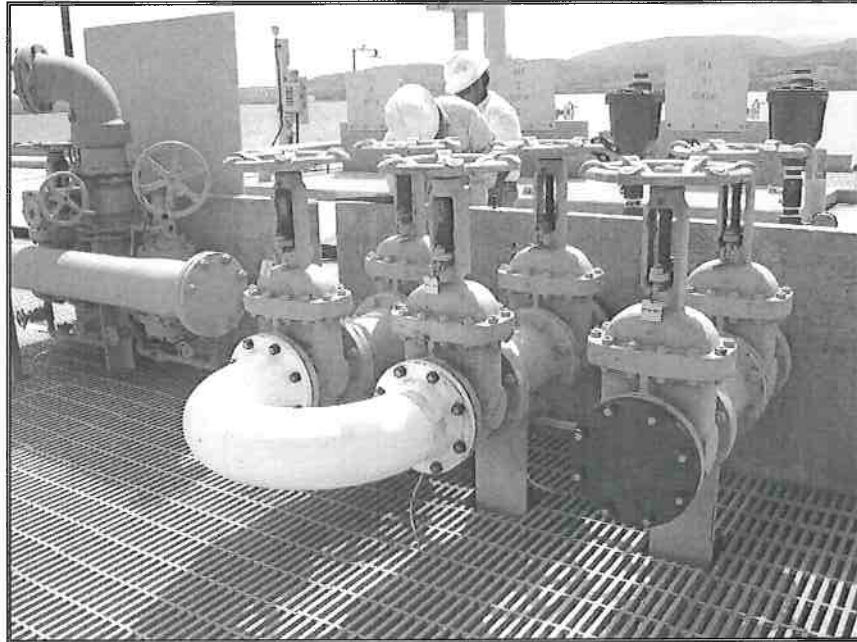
Test No. 3 Pier 1A Test Location
